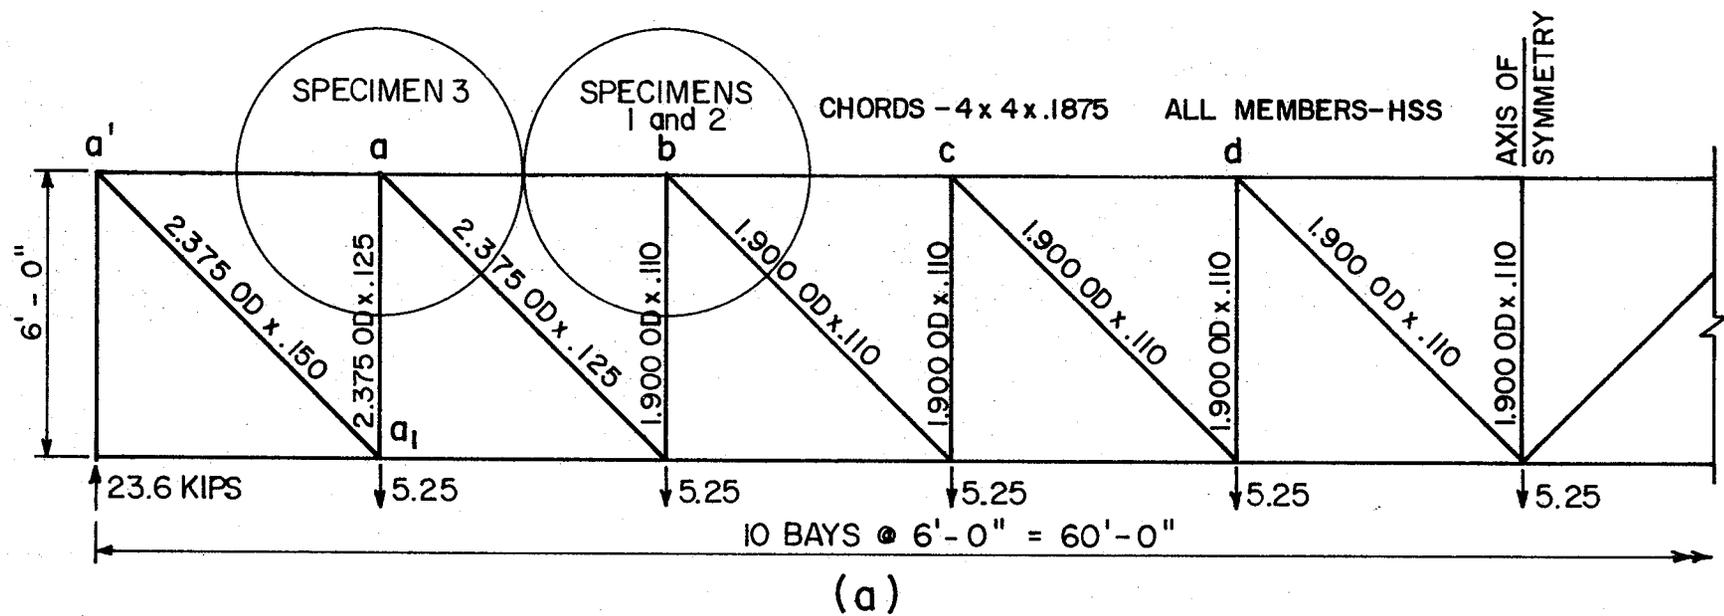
TRUSSES ASSUMED IN DESIGN OF TEST SPECIMENS
